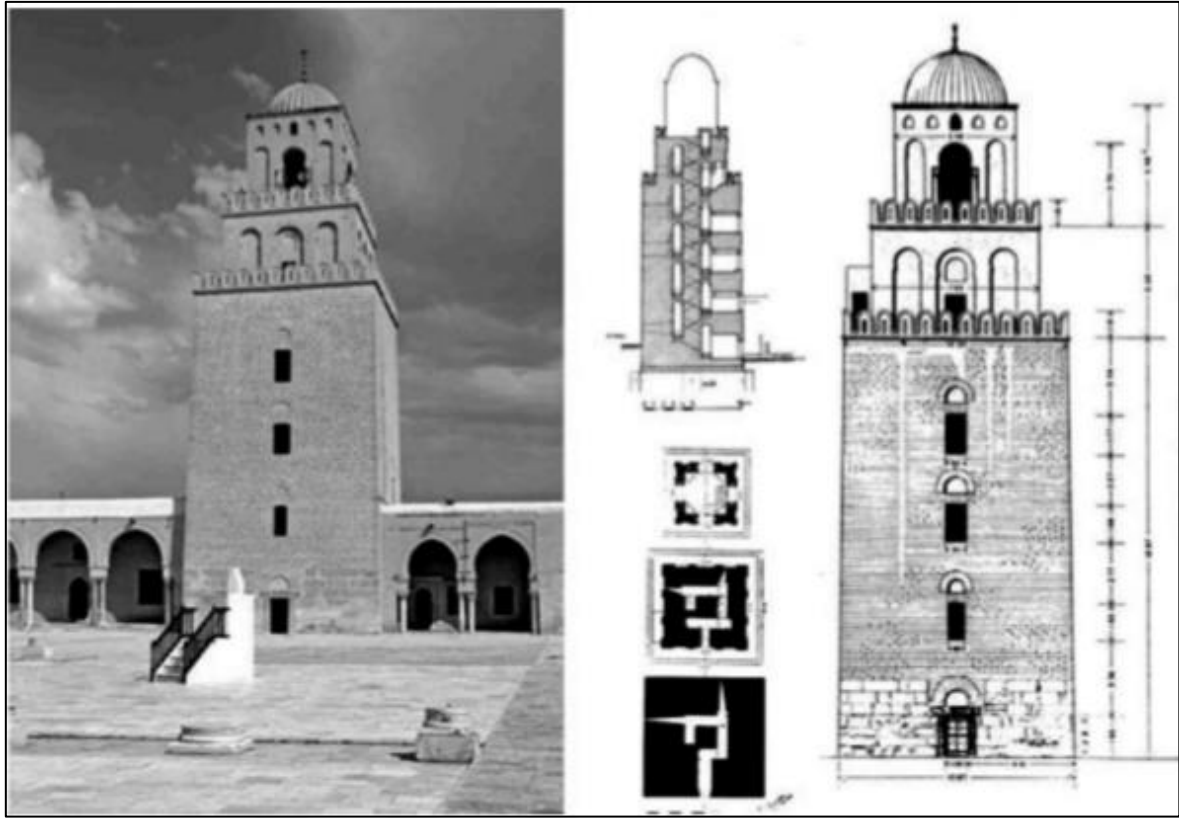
Detailed Sketch of Kairouan Minaret Comprising Elevation, Section, Plan, and View [8].
